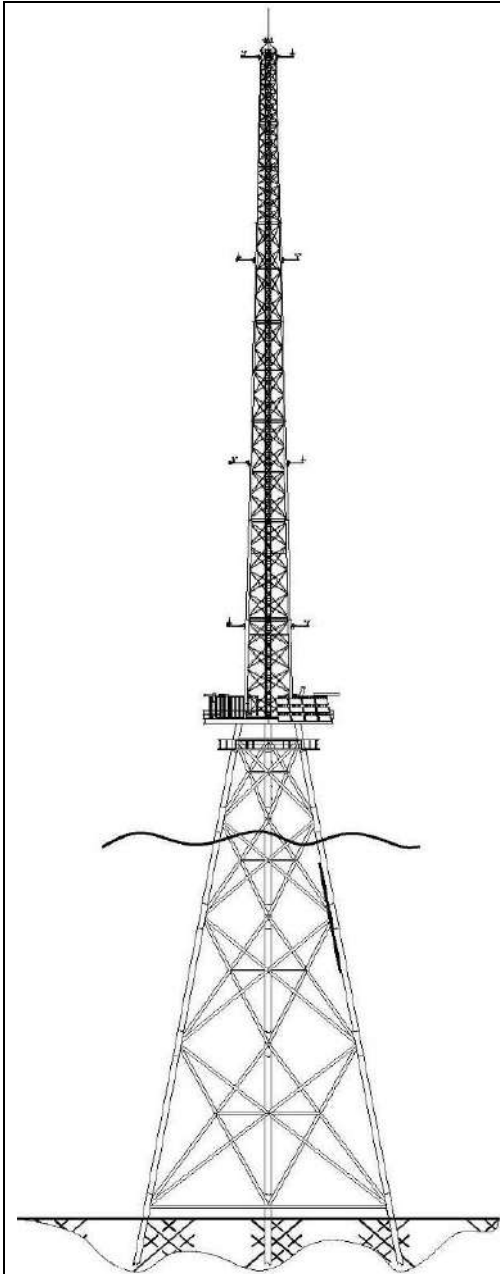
(a) Example of a Lattice-type Mast Mounted on a Steel Jacket Foundation.
